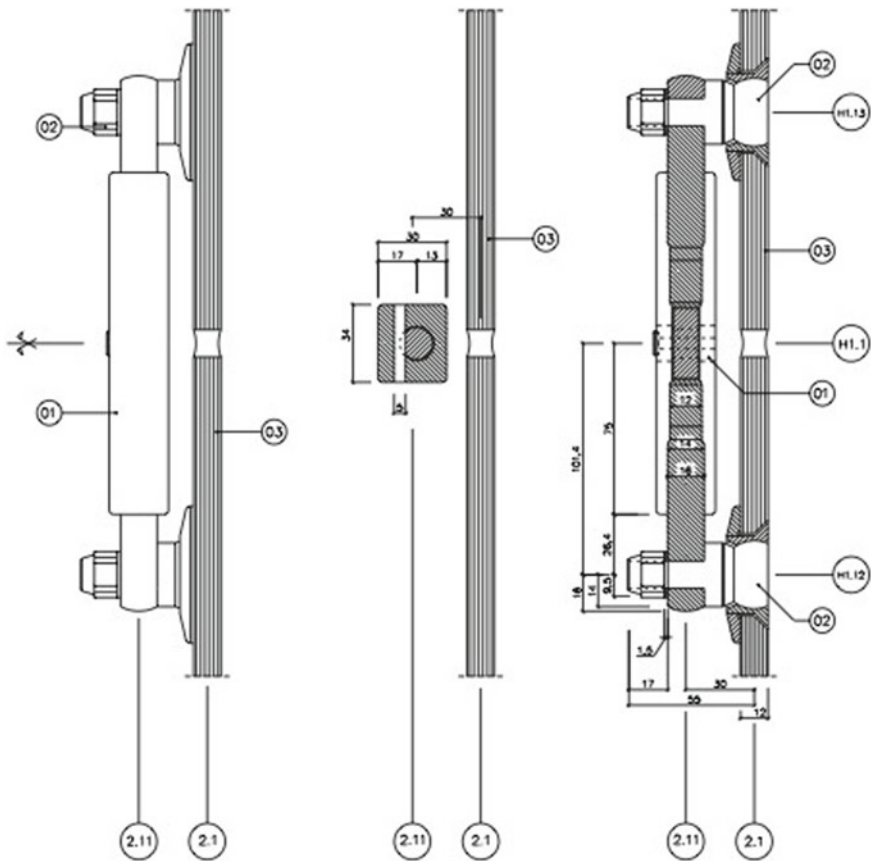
Nicholas Grimshaw and Partners, *The Western Morning News*, Plymouth (Great Britain). Point fixing device with four-way *rotulles*, articulated in relation to the central pivot supported by the brackets, with steel cable reinforcement. © Courtesy of Nicholas Grimshaw and Partners
